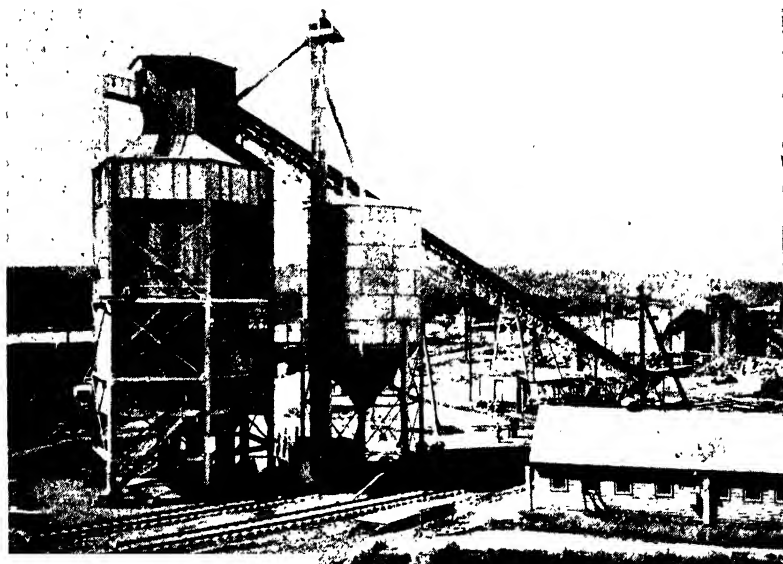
Vertical bucket elevator delivering cement to mixing plant or to 4,000-bbl. storage silo.
